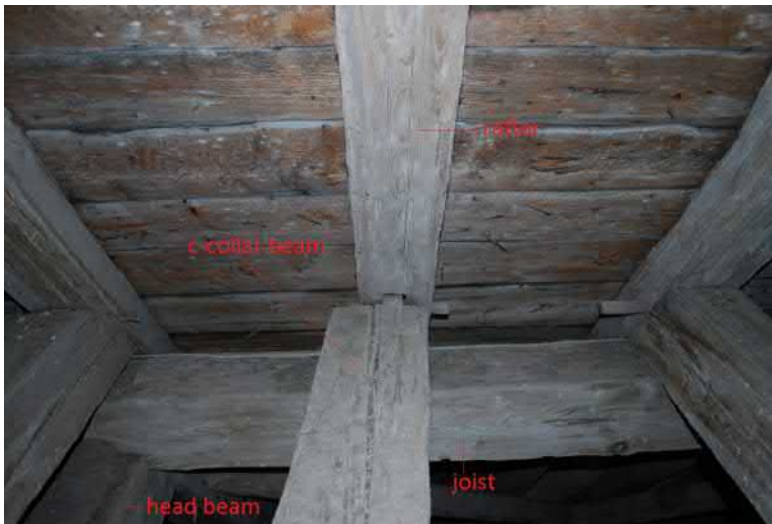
Notched joist lying above the head beam. C-collar beam and the rafter is connected with doweled mortise and tenon joint. See detail A in figure 18.
